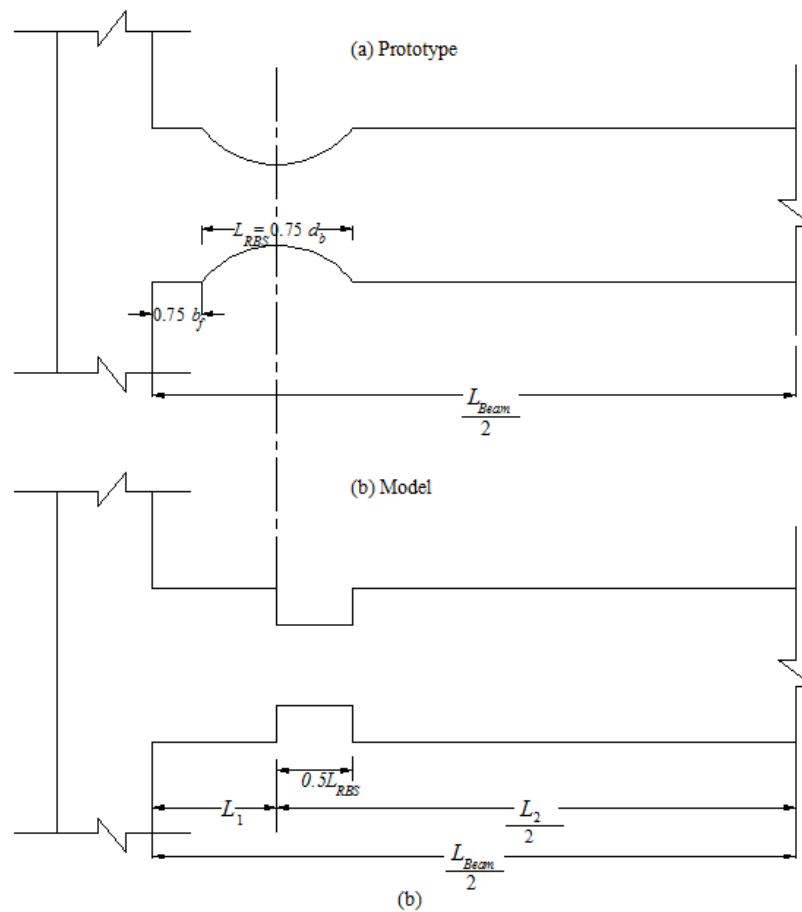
For RBS, (a) plan view with typical geometry, and (b) 3-element frame model.
